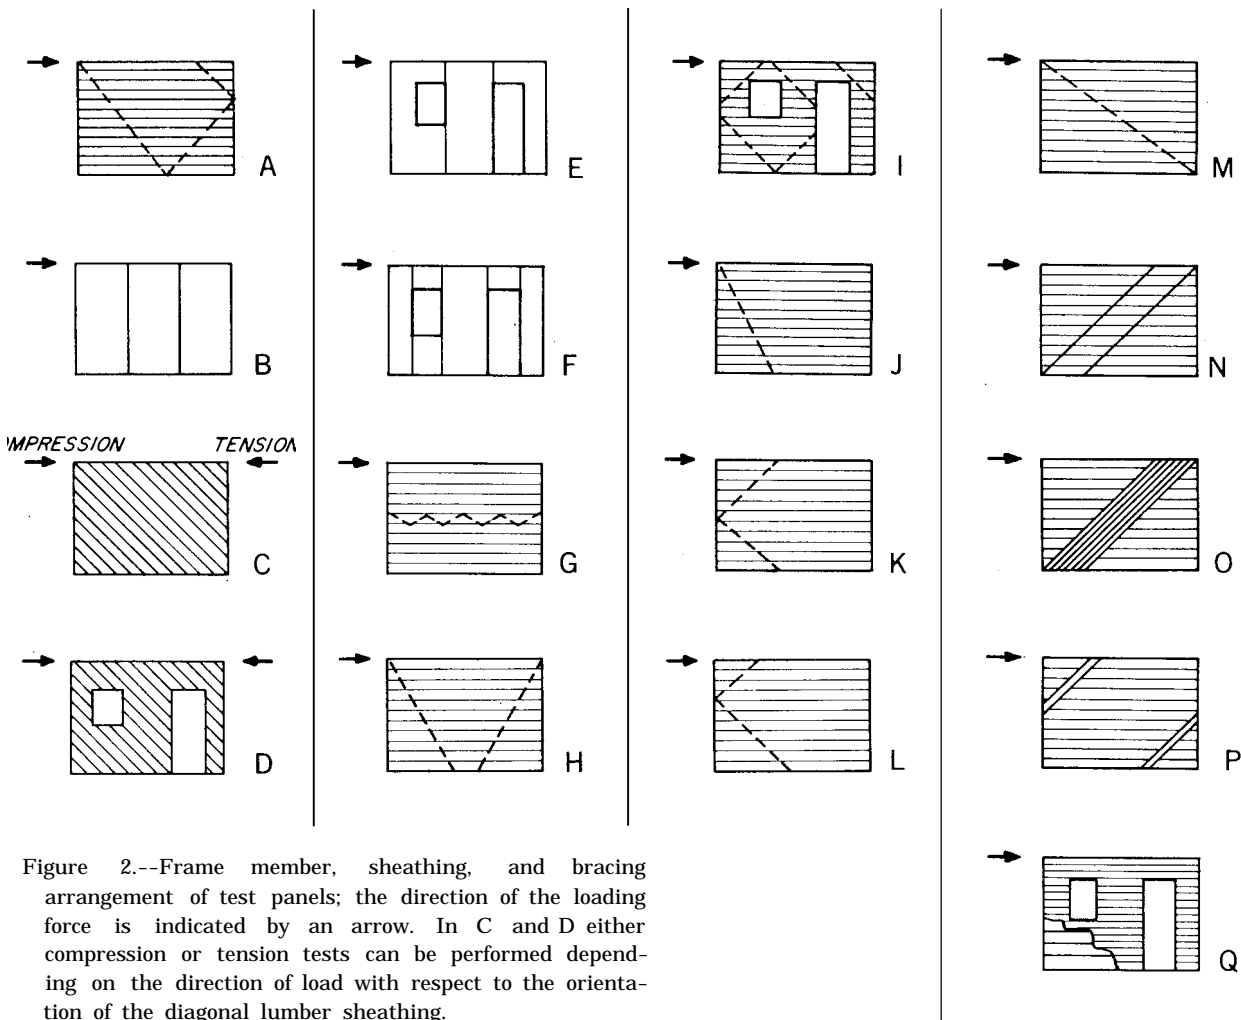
Frame member, sheathing, and bracing arrangement of test panels; the direction of the loading force is indicated by an arrow. In C and D either compression or tension tests can be performed depending on the direction of load with respect to the orientation of the diagonal lumber sheathing.
